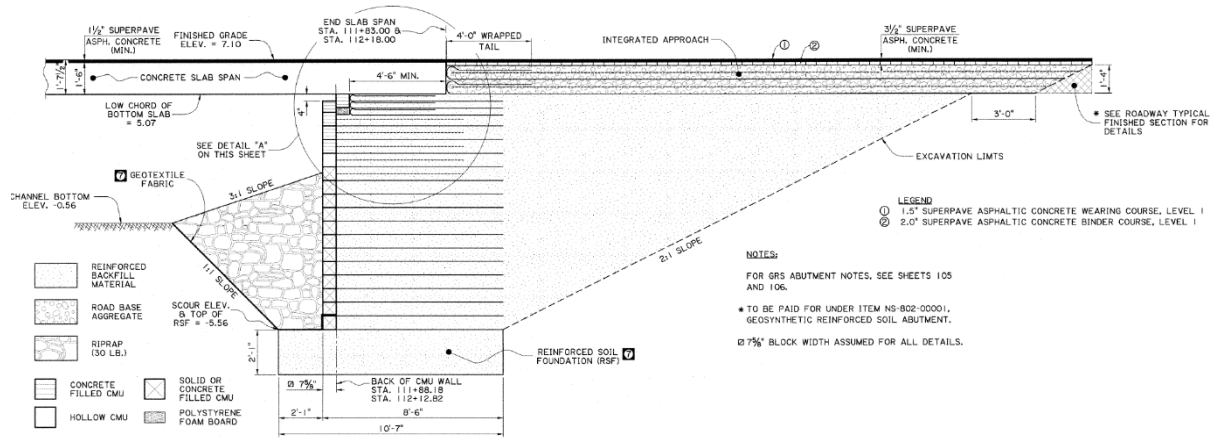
Diagram. GRS abutment section view of Unnamed Creek Bridge.
